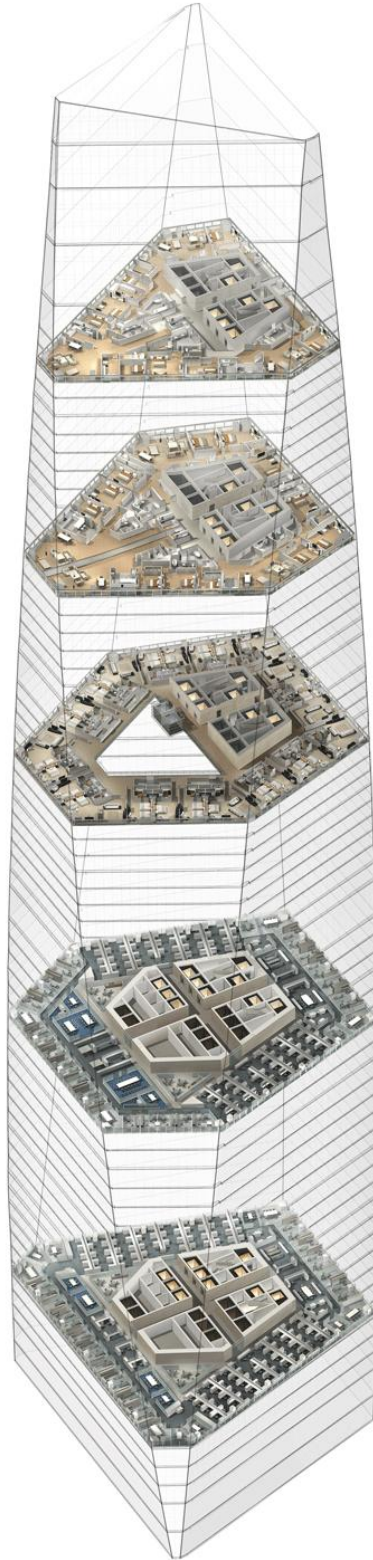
Architectural and planning structure of Posco Tower-Songdo
